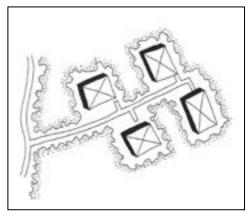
Site fingerprinting limits site disturbance to the minimum necessary for building. (Source: Greenfeld and others, 1991, p. 51)
